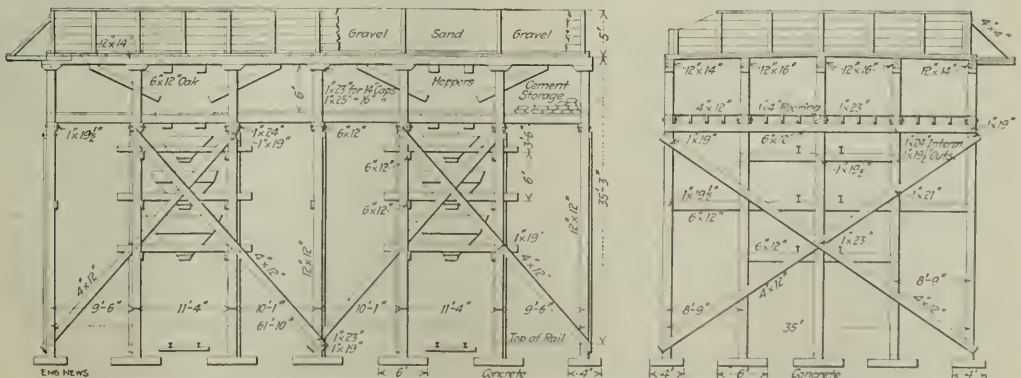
DETAILS OF CONCRETE-MIXING PLANT FOR CONSTRUCTION OF CLEVELAND FILTRATION PLANT
